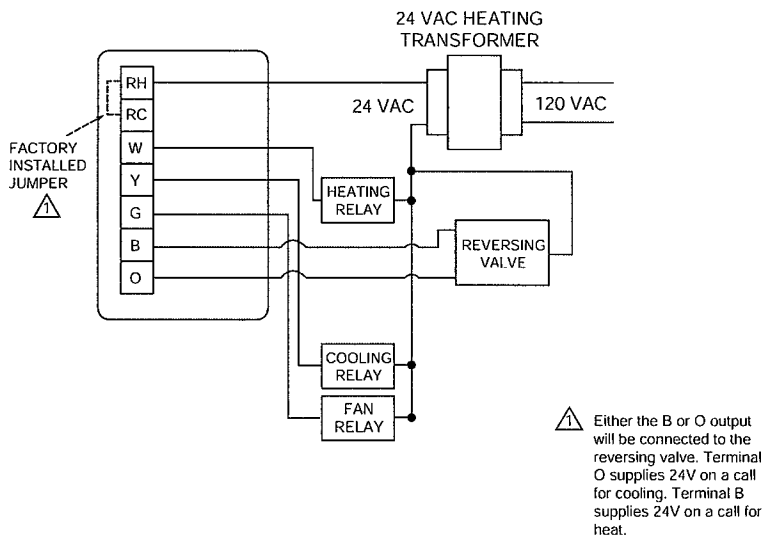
Typical T207 Wiring To Heating/Cooling System With Single Transformer & Reversing Valve.
